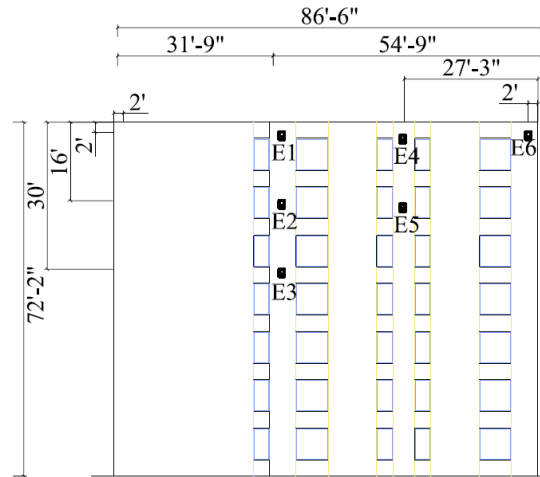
South-east elevation of McLeod House with driving rain gauge locations
